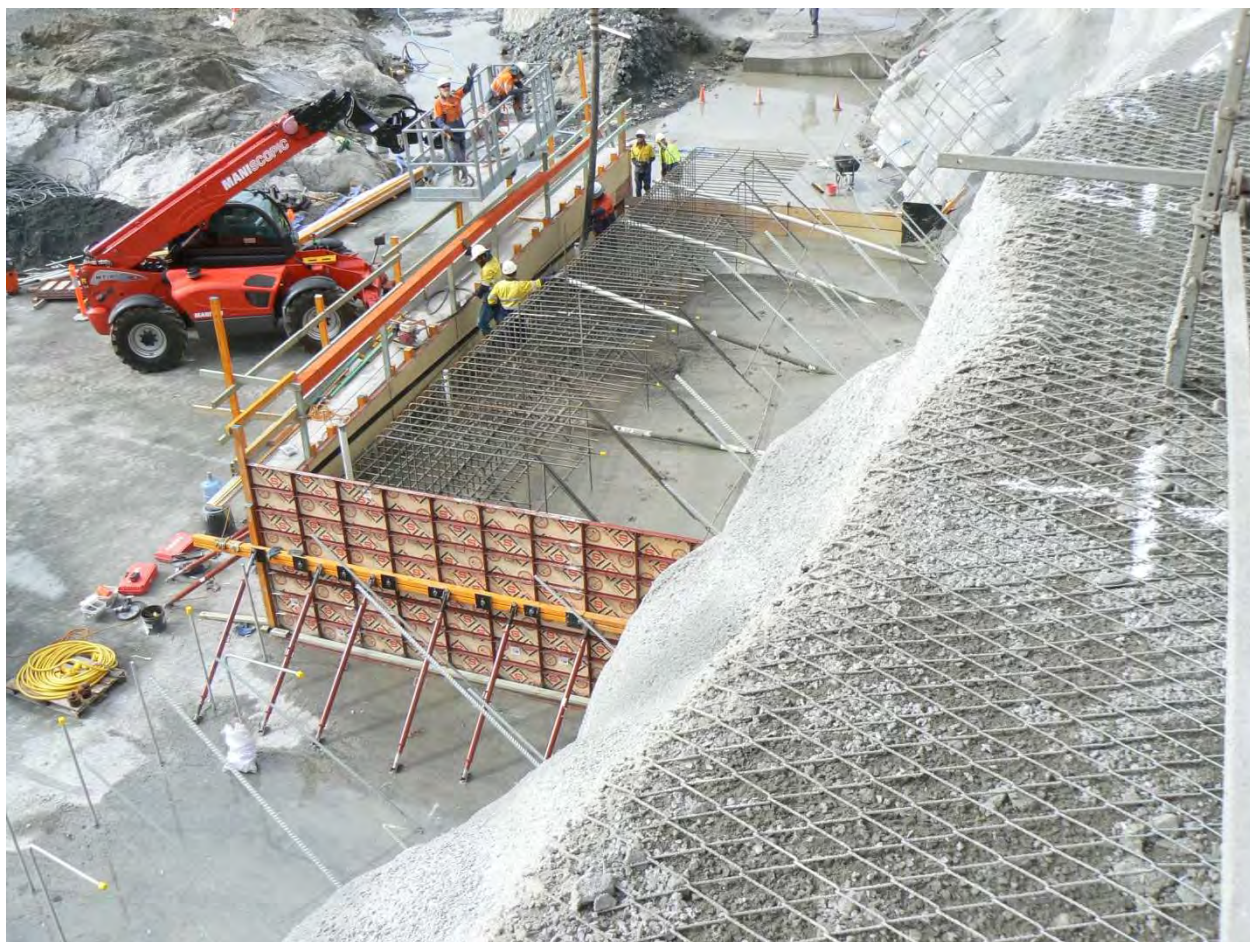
Preparing for Concrete to Protect Steep Scour Face at Left End of Spillway
